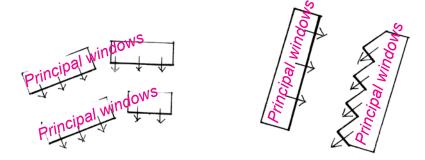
plan shows principal windows avoiding overlooking to adjoining properties. The minimum separation distance will vary depending on height.
